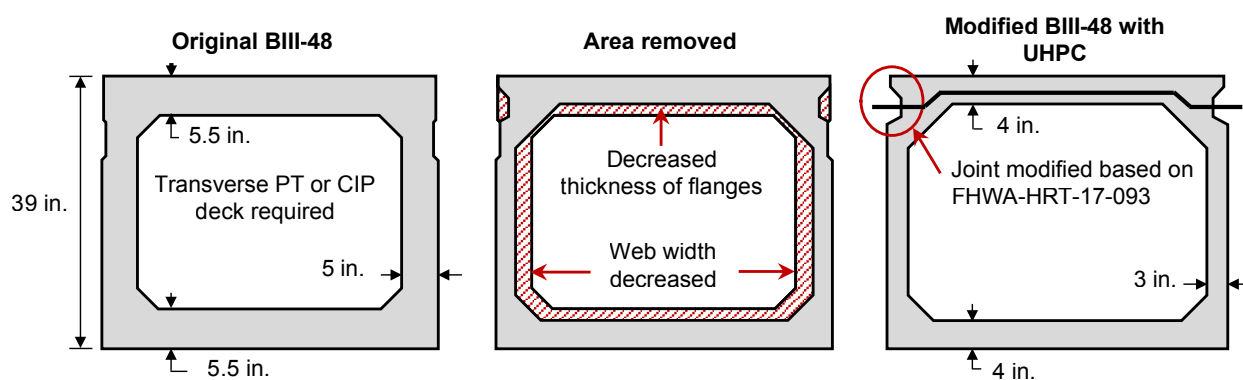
Example of section optimization for BIII-48 box beam from the existing section shape for conventional concrete to a possible section using ultra-high-performance concrete (UHPC). Source: Adapted from Yuan et al. (2018). Note: CIP = cast-in-place; FHWA-HRT-17-093 = *Adjacent Box Beam Connections: Performance and Optimization*; PT = post-tensioning. 1 in. = 25.4 mm.
